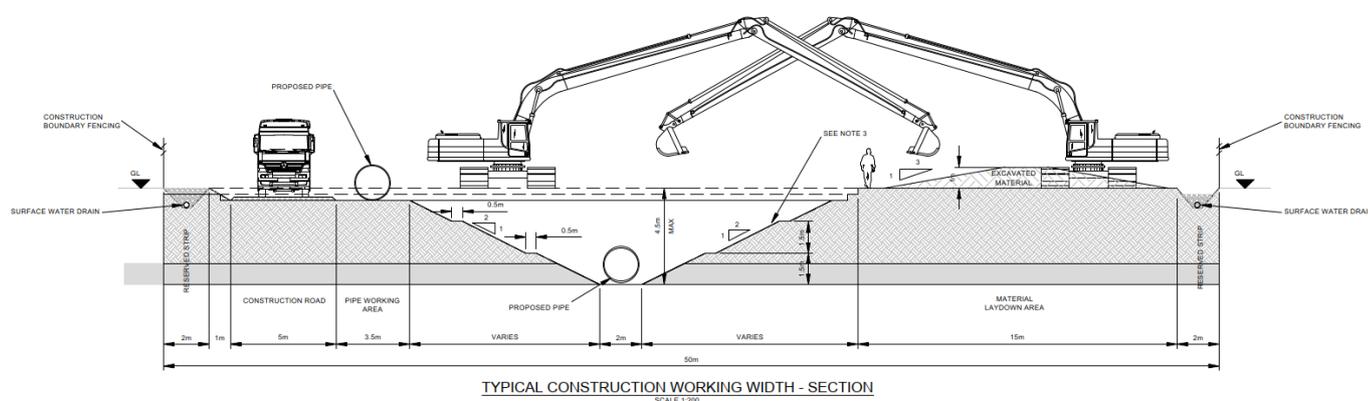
Indicative Construction Working Width Cross Section in Peat Areas
